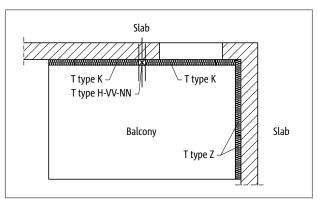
Schöck Isokorb® T type H: Cantilevered balcony
